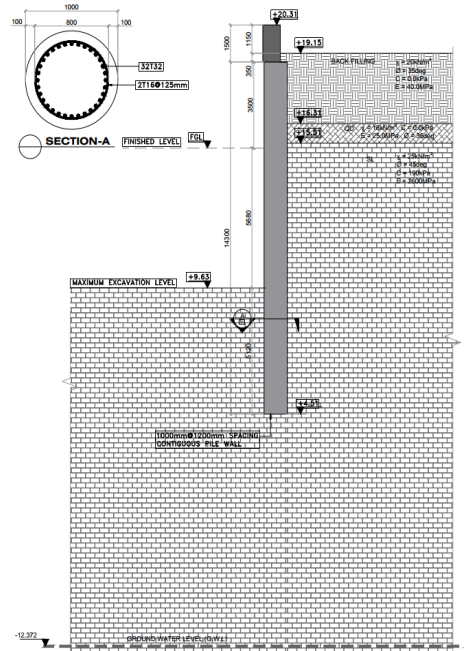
The proposed cross-sectional of the contiguous piles wall system
